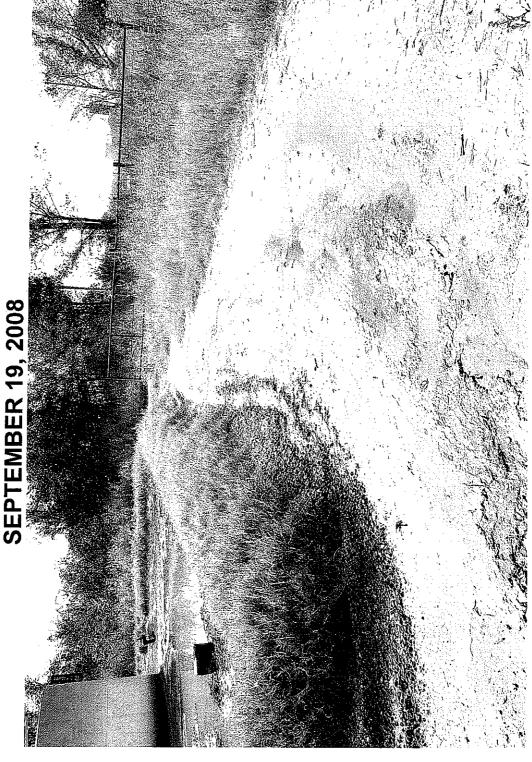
taken west. North side of berm wall leaking out the base. Runs east then south toward creek.
